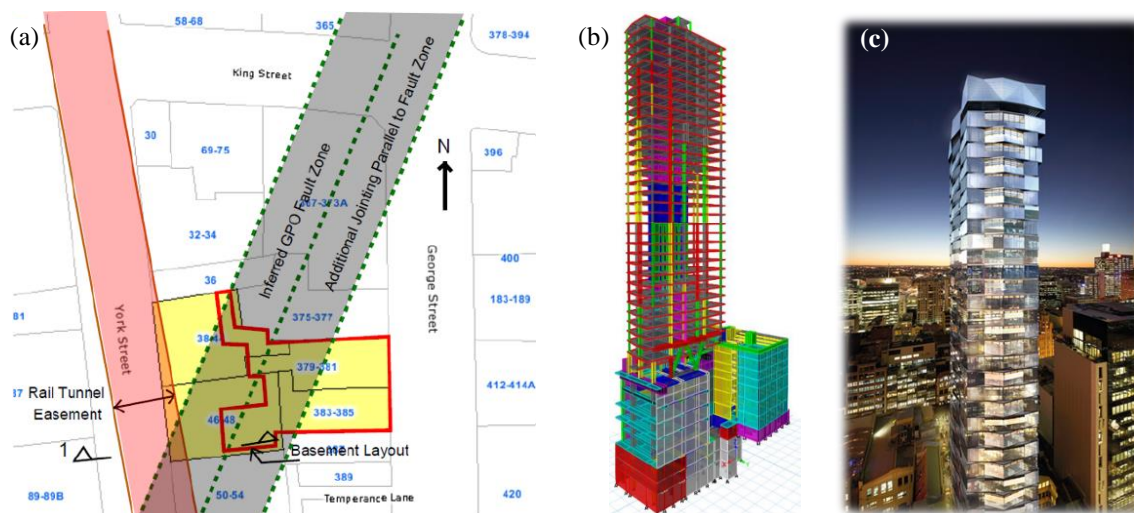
York and George development in Sydney CBD: (a) location plan with old basement layout (b) model illustrating the structural concept (c) artistic impression.
